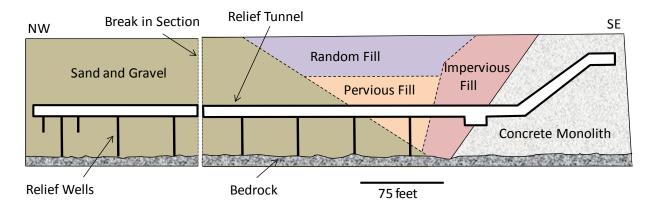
Generalized Cross Section of the Relief Tunnel, looking upstream.
